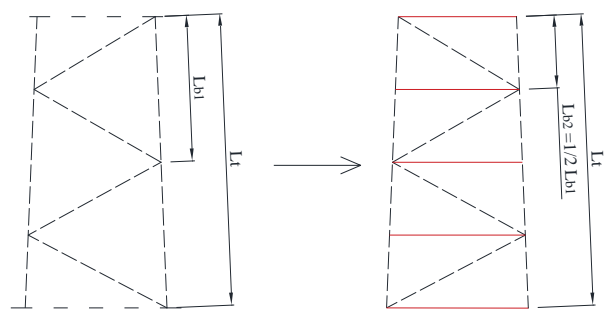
Reinforcement scheme of a tower with a single bracing pattern – additional cross-bars
